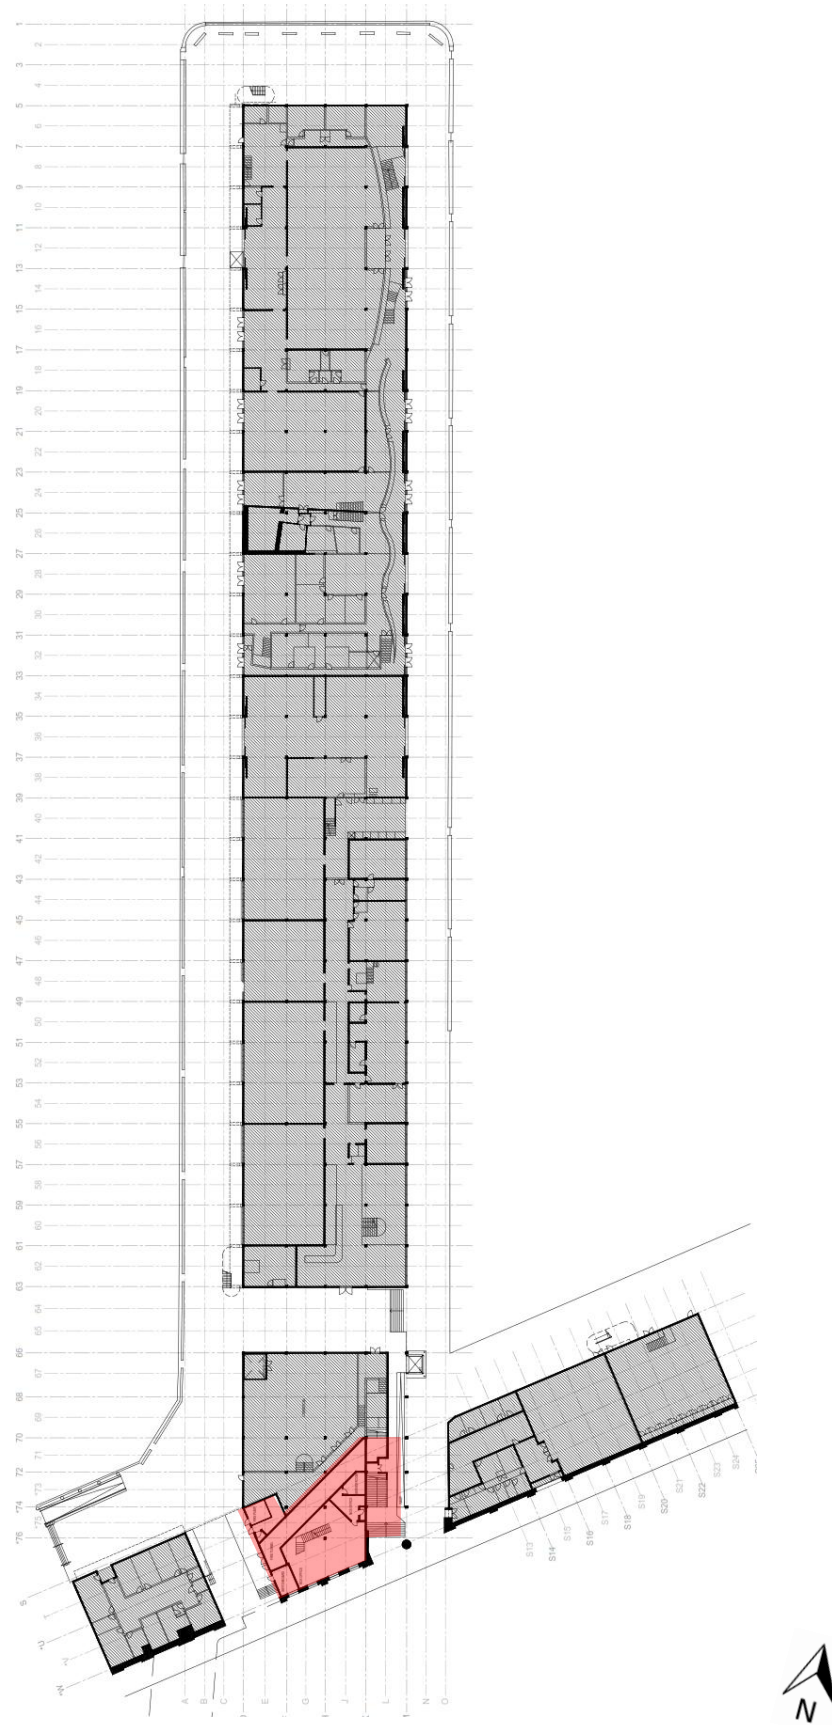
Existing Ground Floor Plan Wharf 4/5. Highlighted in red the subject area
